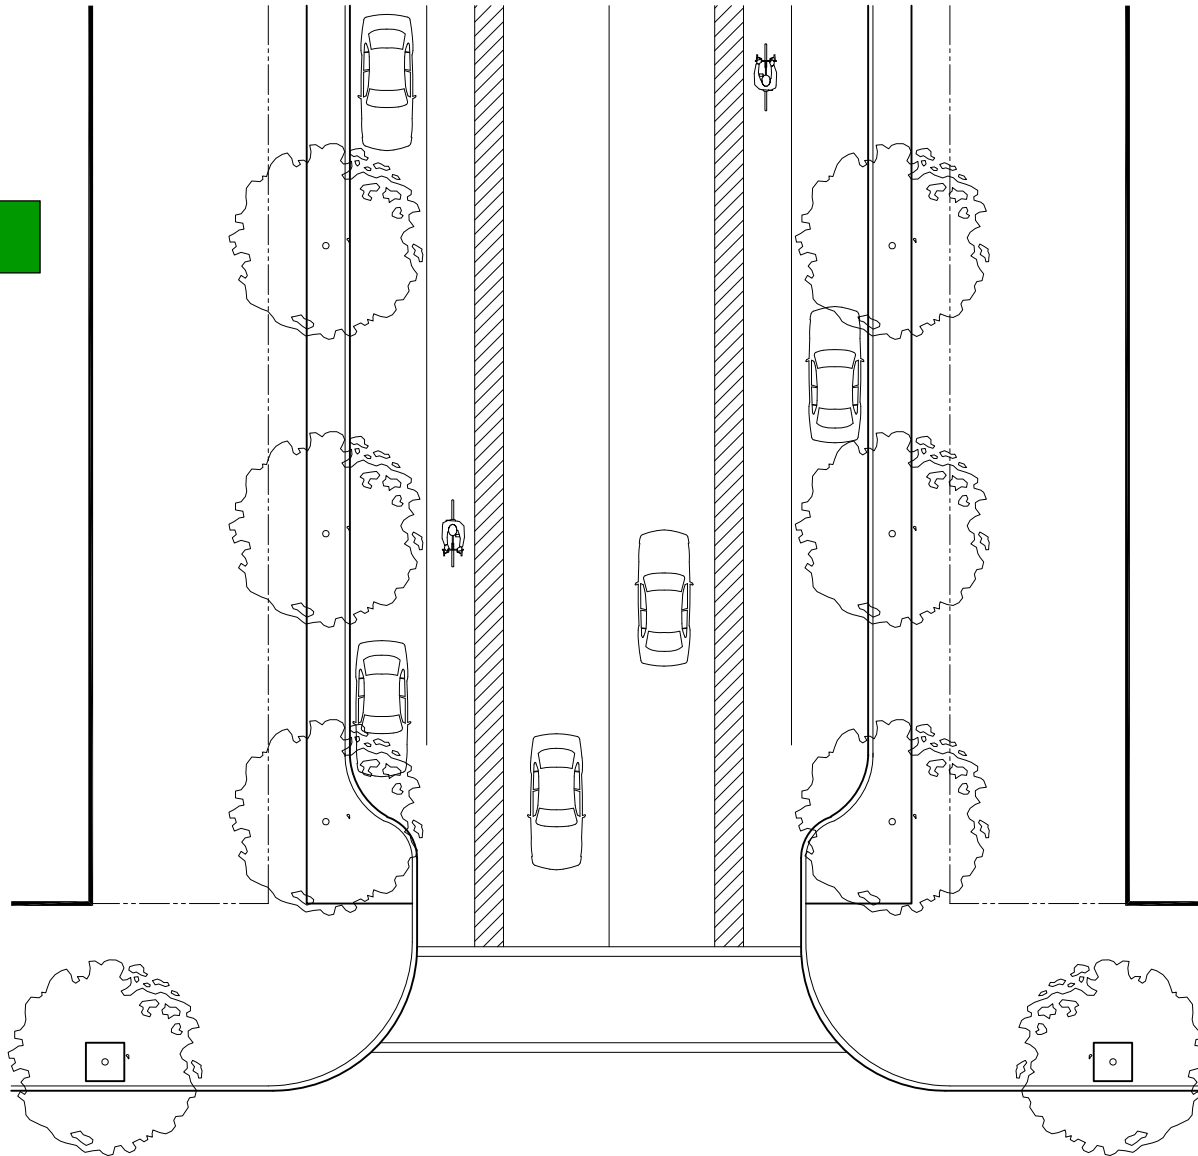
Street Type 4.2: Typical Intersection (Plan View)
